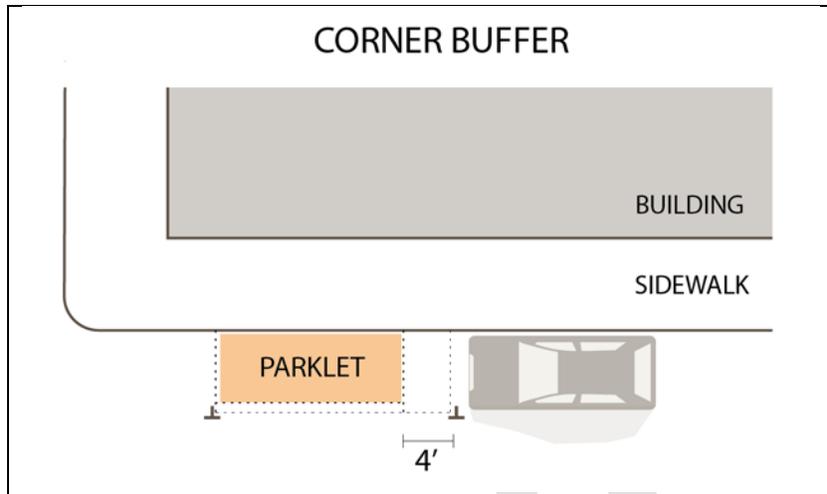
F.3.d. Parklet Minimum Dimensions
